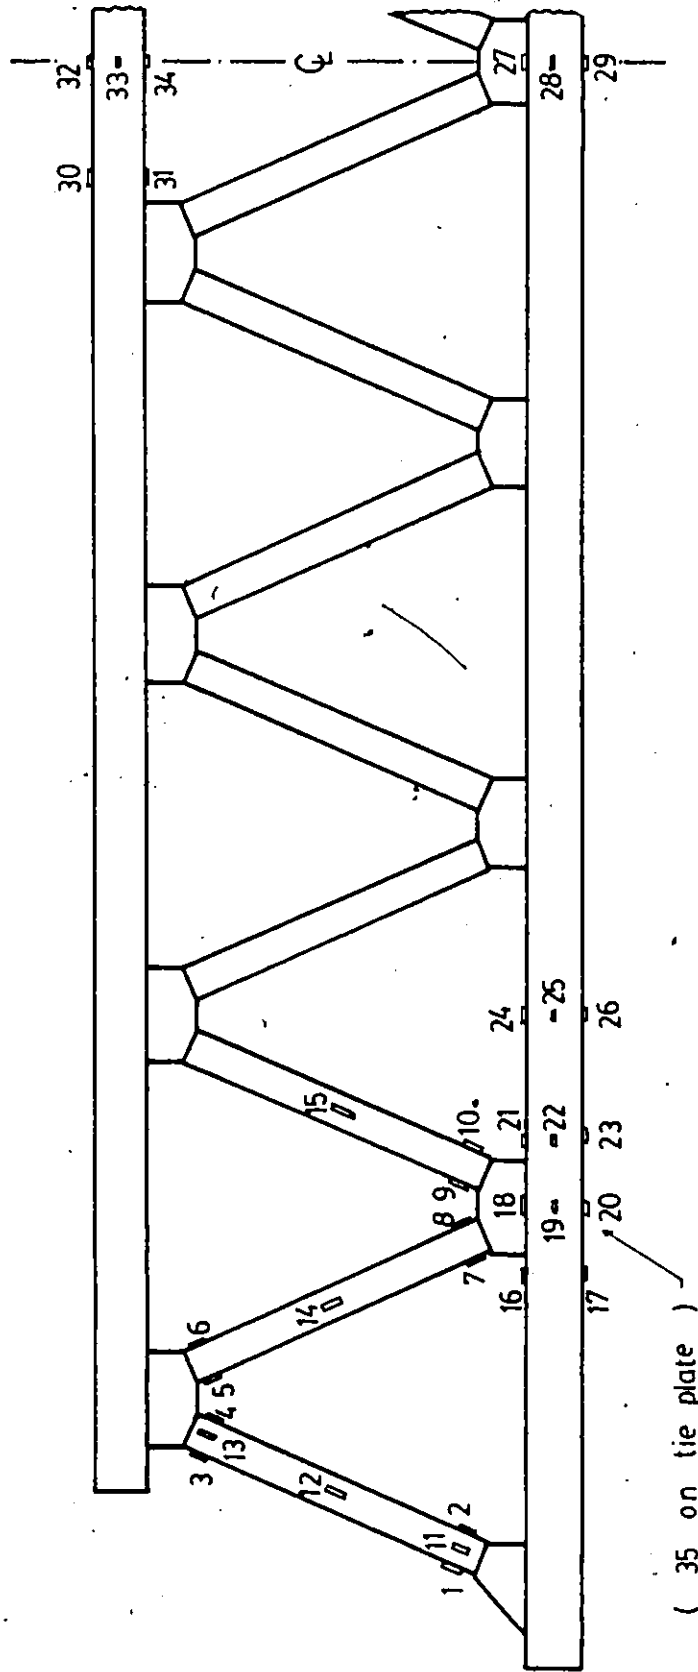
LAYOUT OF STRAIN GAUGES FOR TRUSS B0
